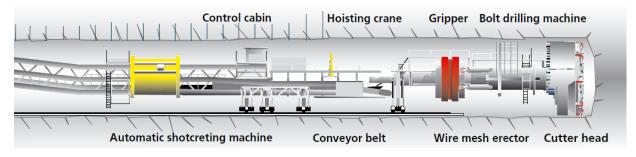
Longitudinal section of a TBM (Unterschütz 2004).
